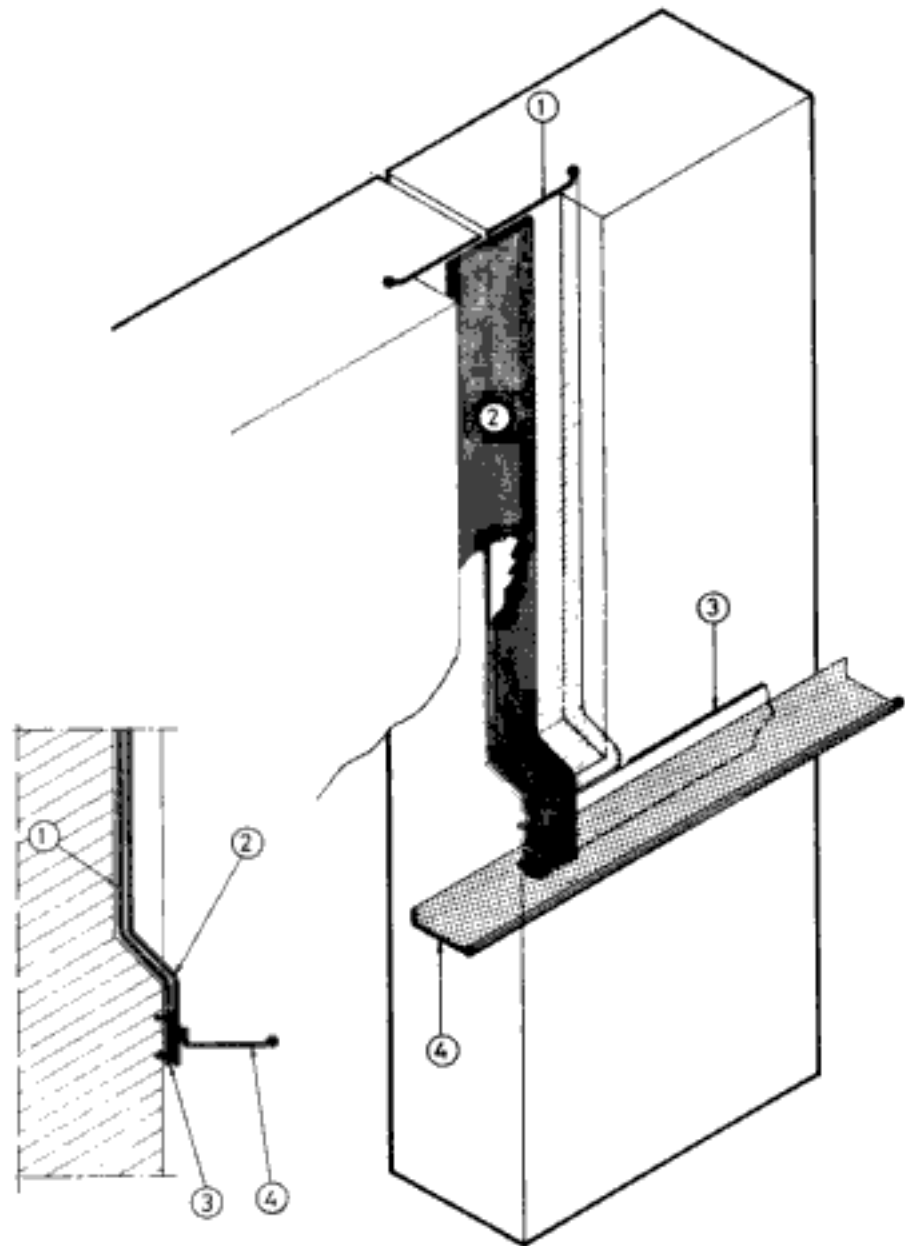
Vitny culvert: water bar system with continuity between vertical and horizontal water bars (courtesy of Bachy)
